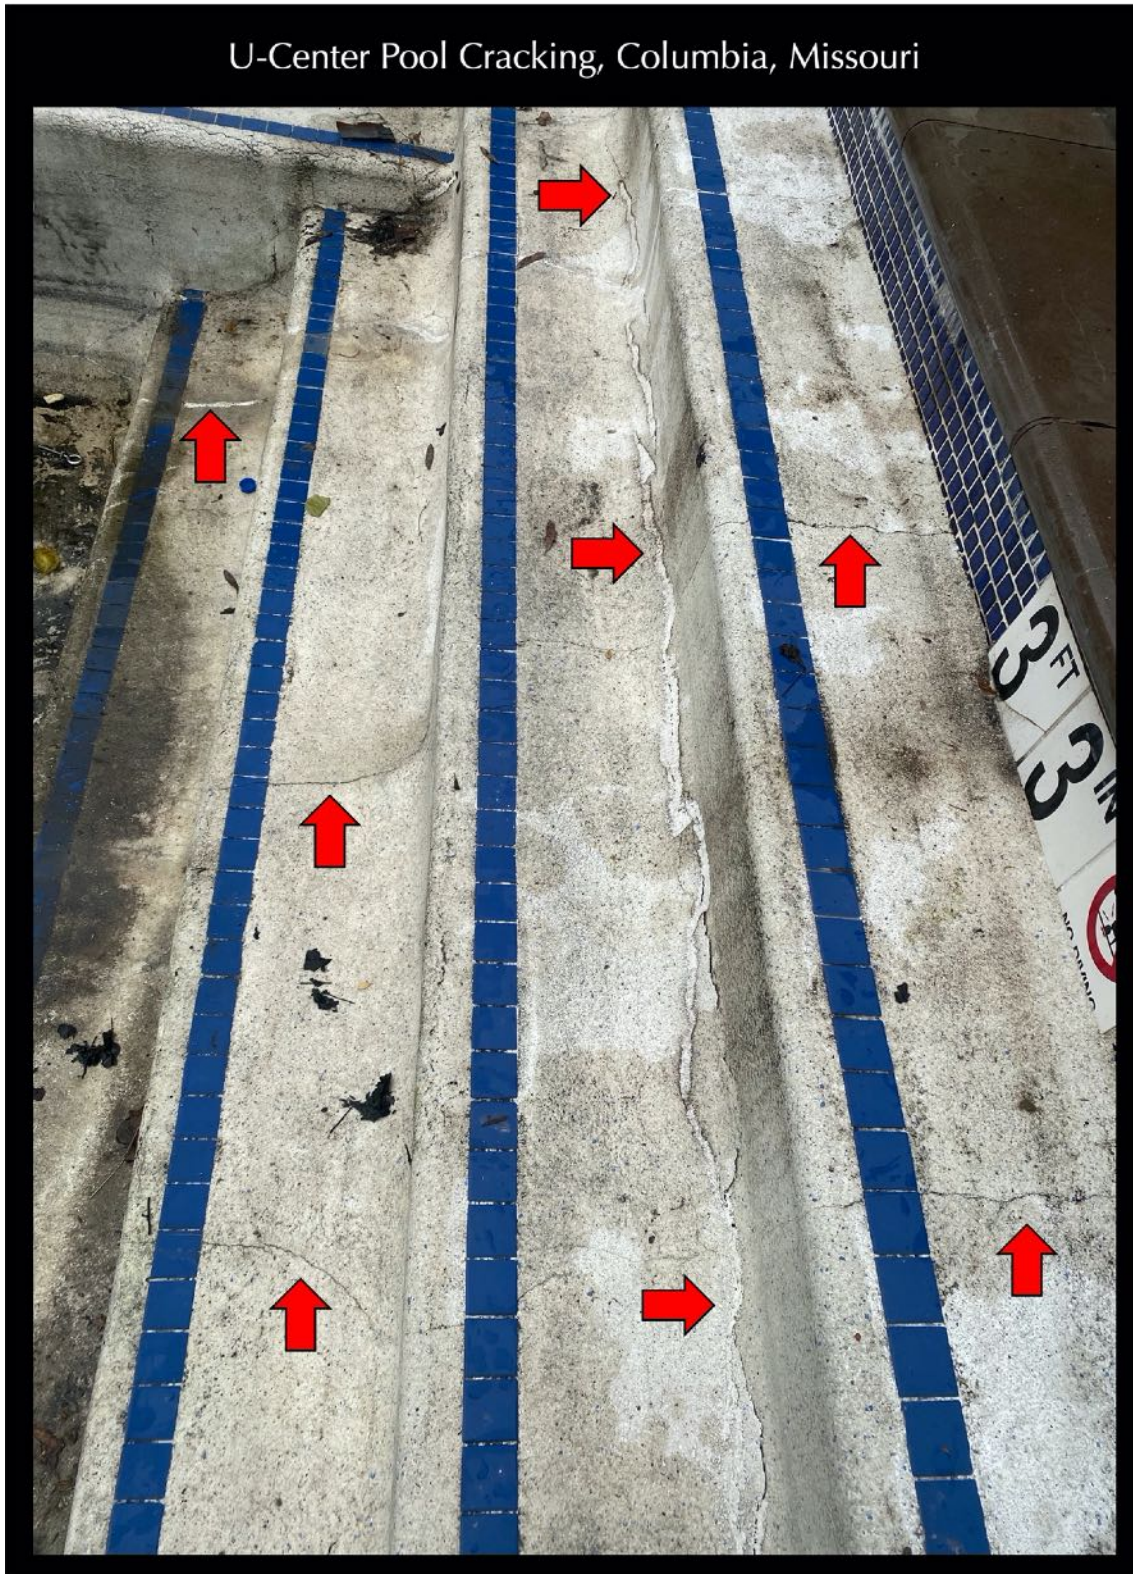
Long, parallel longitudinal and transverse through-steps cracks marked by red arrows. Notice many wider cracks were previously attempted to seal with elastomeric crack sealant, yet further development of finer-width unsealed cracks for steady penetration of pool water into the shotcrete.
